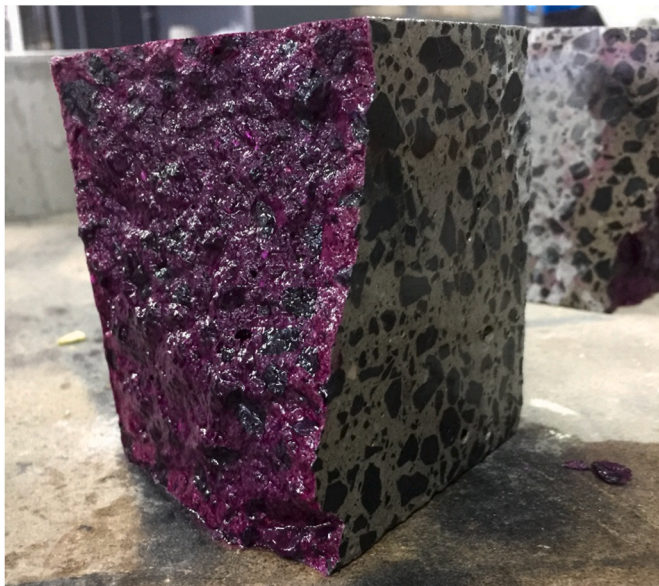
Appearance of the specimens CO₂exposed surface after the pH indicator spraying.
